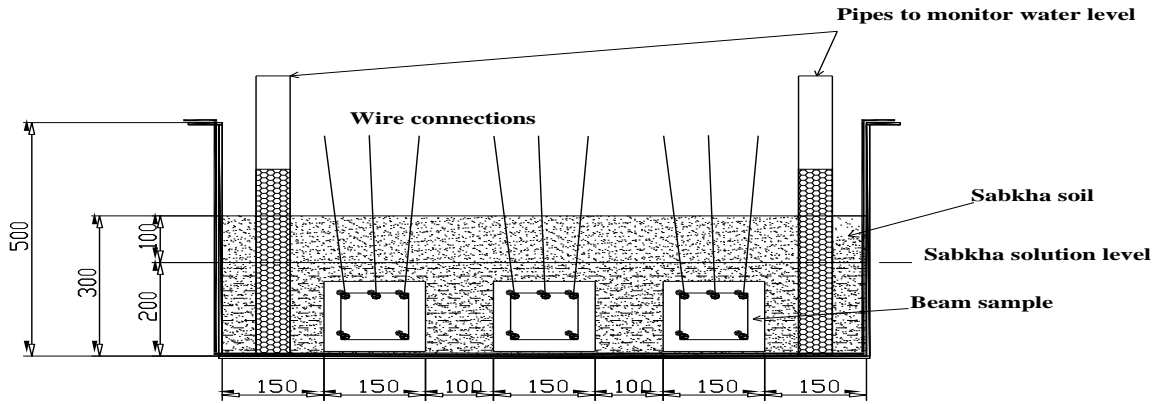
Schematic Diagram of the Concrete Beam Specimens for Exposure to the Submerged Zone.
